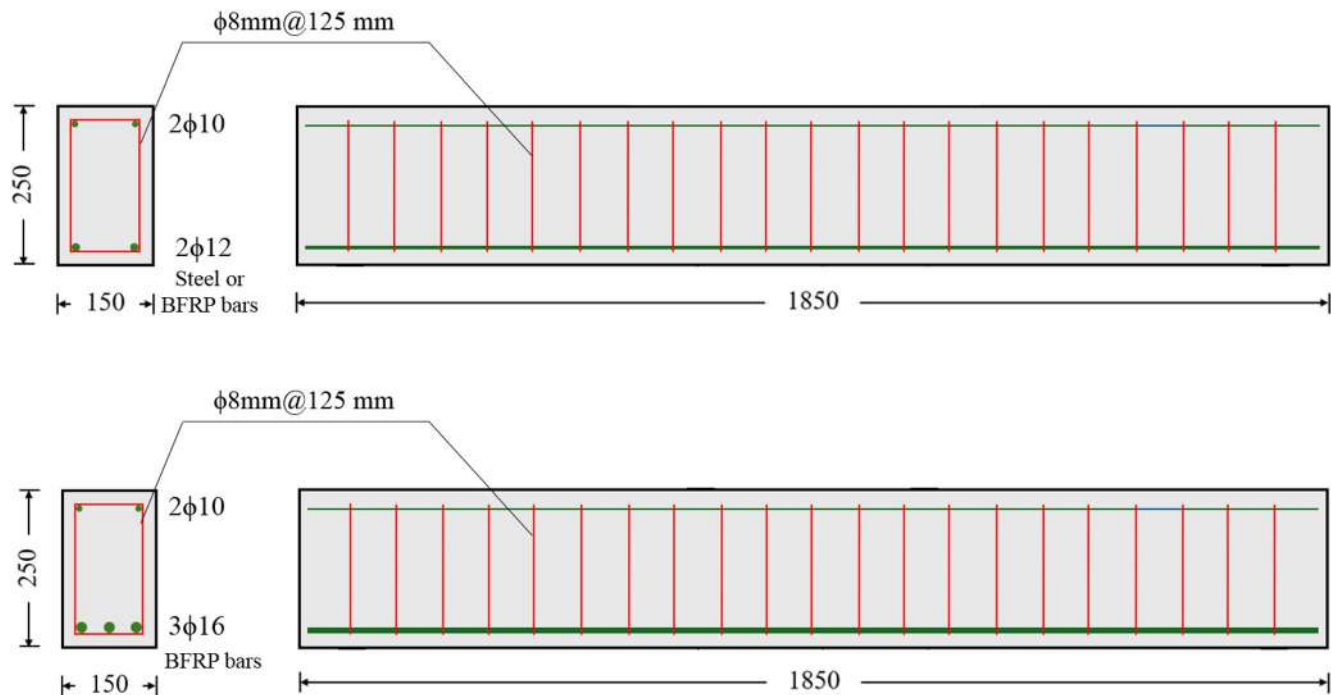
Geometrical details and reinforcement configurations of the tested beams (Dimensions in mm).
